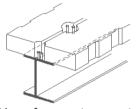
Use of precast concrete floor units Some of the advantages associated with steel composite beam construction are listed below:
